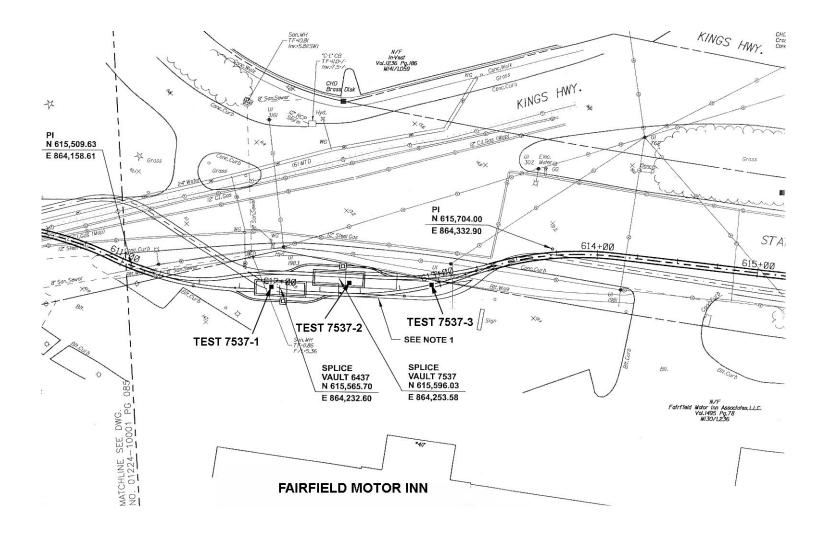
SHOVEL TESTS AT SPLICE VAULTS 6437 AND 7537
